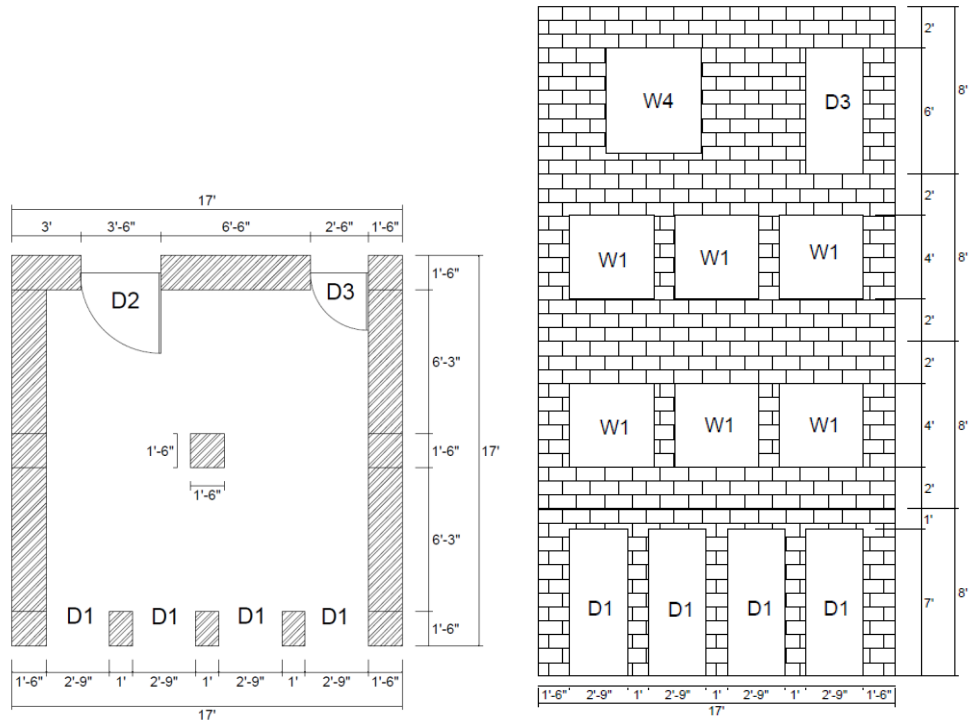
(a) Ground Floor Plan (b) Front Elevation (Building- A)
